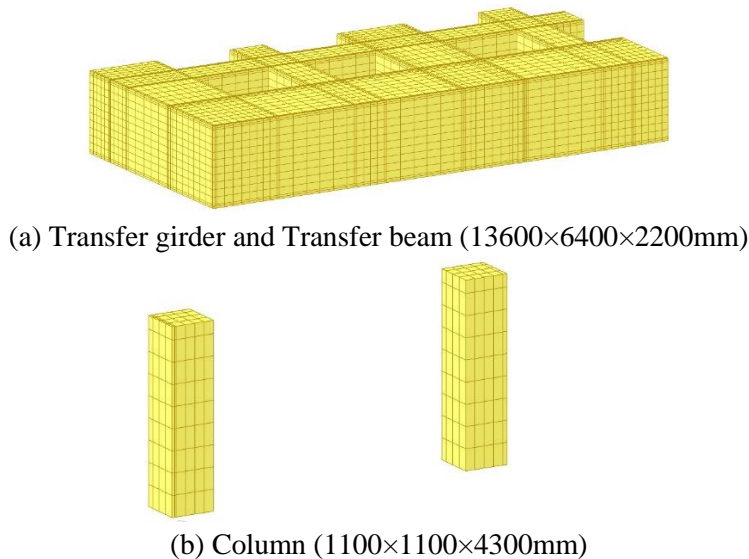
shows the plan of technical floor which has 2400×2200mm sized transfer girder. Heat of hydration analysis was performed on some part of the transfer girder 8. Figure 2 shows the mesh model of columns (1100×1100×4300mm), transfer girders and beams(13600×6400×2200mm). As a construction stage, after 50MPa column was cast and cured a week, transfer girders and beams were cast one shot pouring.
